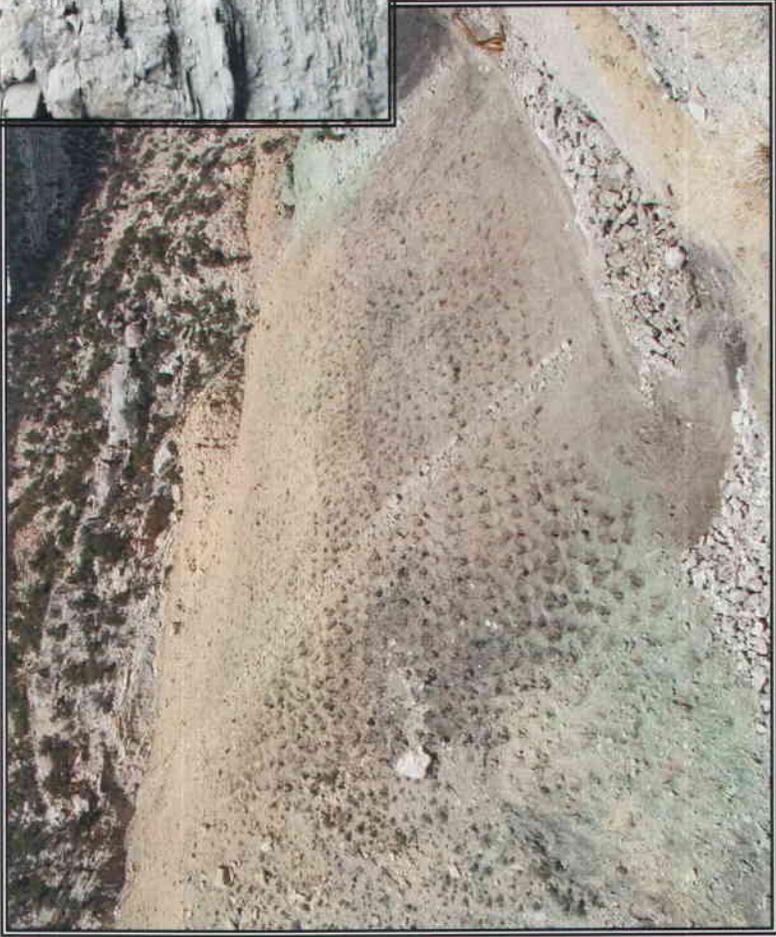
Final reclamation of bathhouse pad. The track-hoes and dozer work to reclaim down slope to canyon bottom. An additional 20,500 yards of substitute topsoil material was gained from two excavated bathhouse pad trenches and the bathhouse outslope. Rock and soil from this work was used to riprap the main channel and cover the opposite side of the canyon with a substitute topsoil material.
